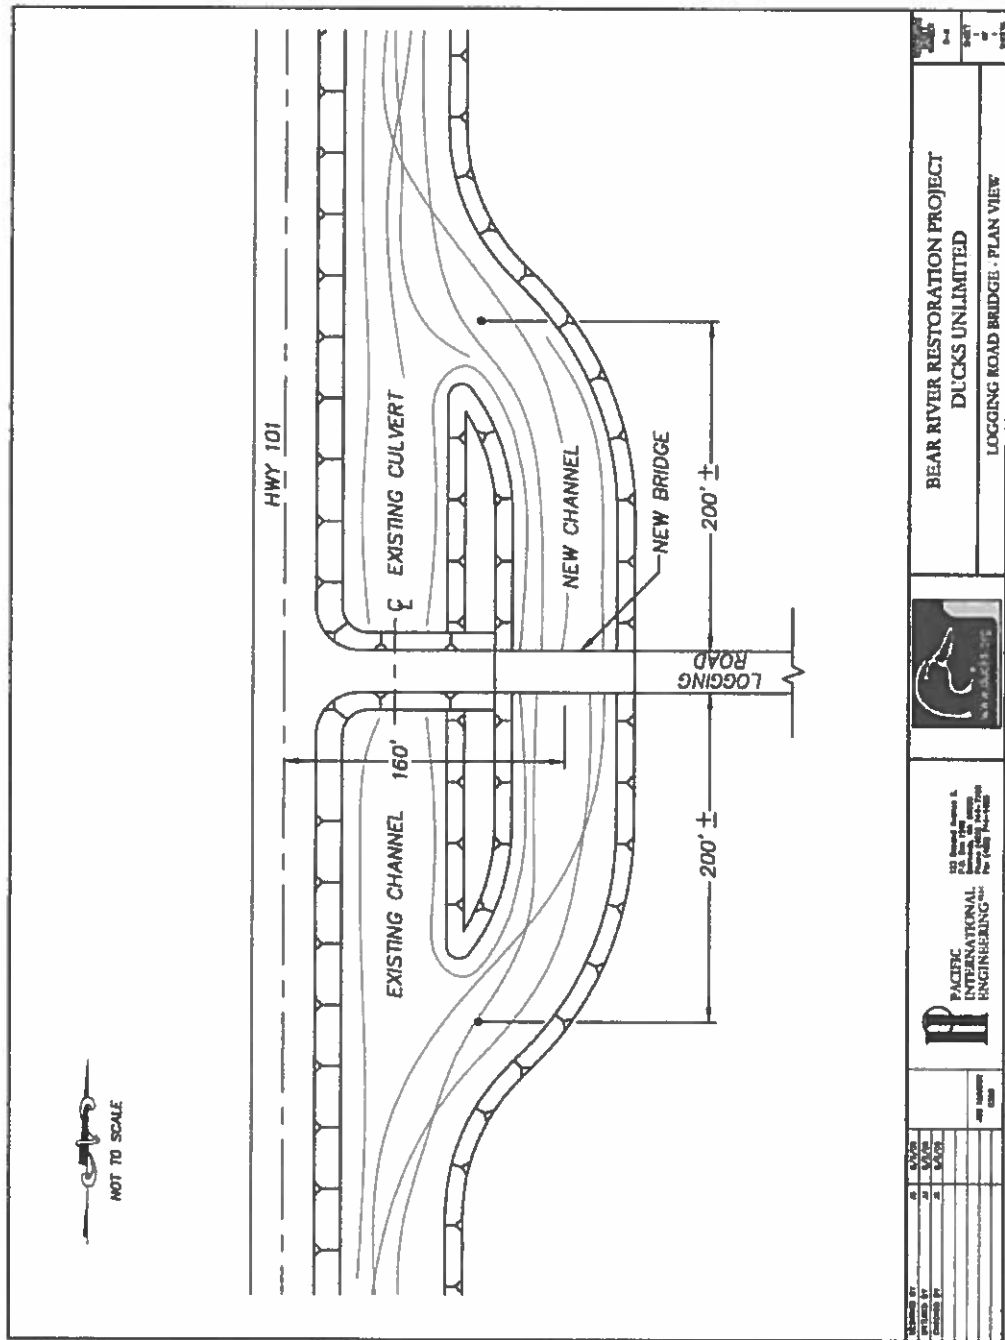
Preferred Alternative Logging Road Bridge Plan View
